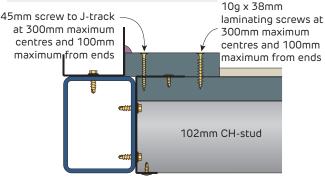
Construction of Shaft Wall Ceiling and Bulkhead Section
